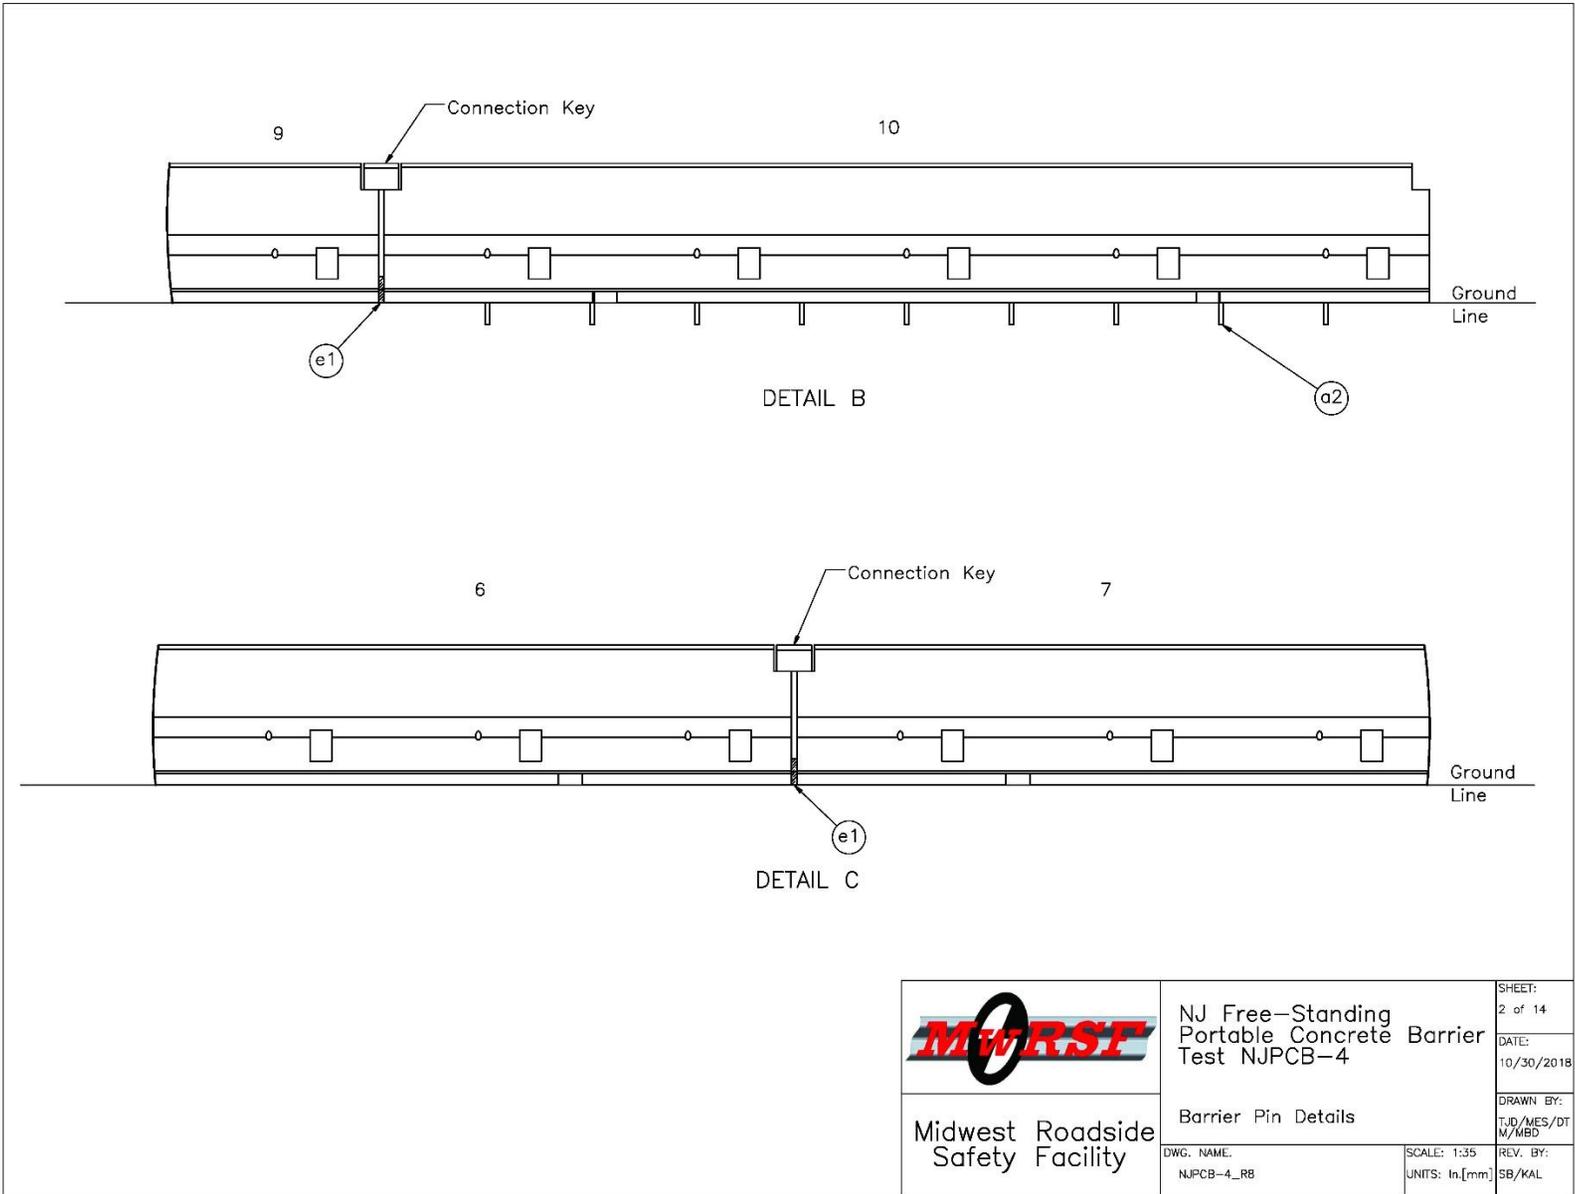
PCB Pin Anchor Details, Test No. NJPCB-4
